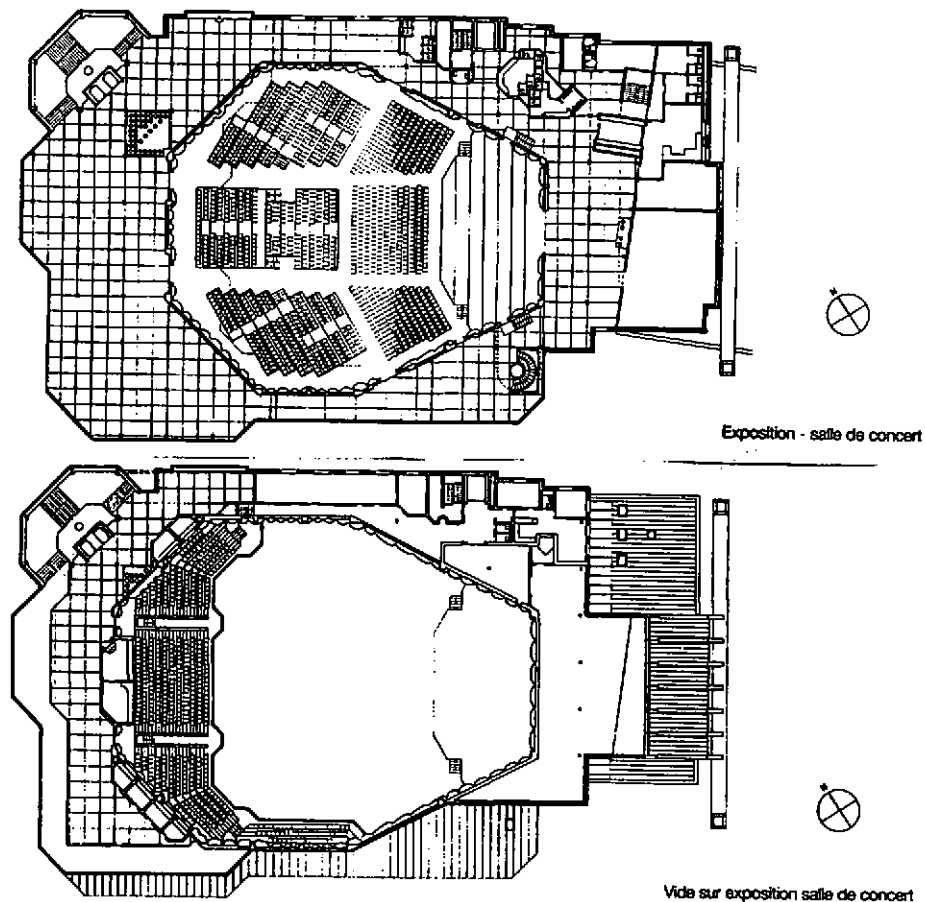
Plans of stalls and balcony (scale roughly 1:736)
